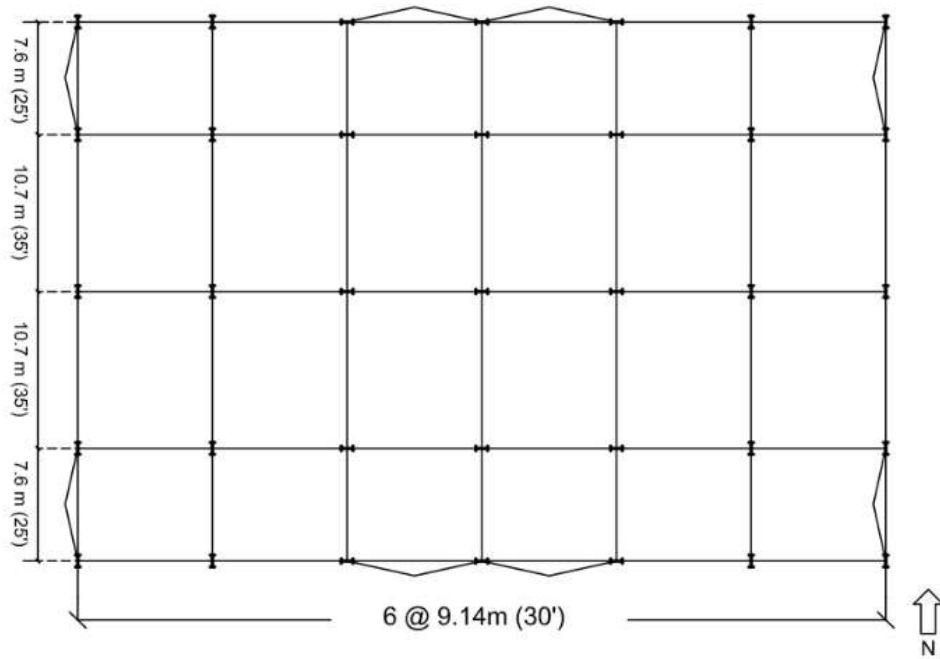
Floor plan of prototype SCEBF-D type buildings
